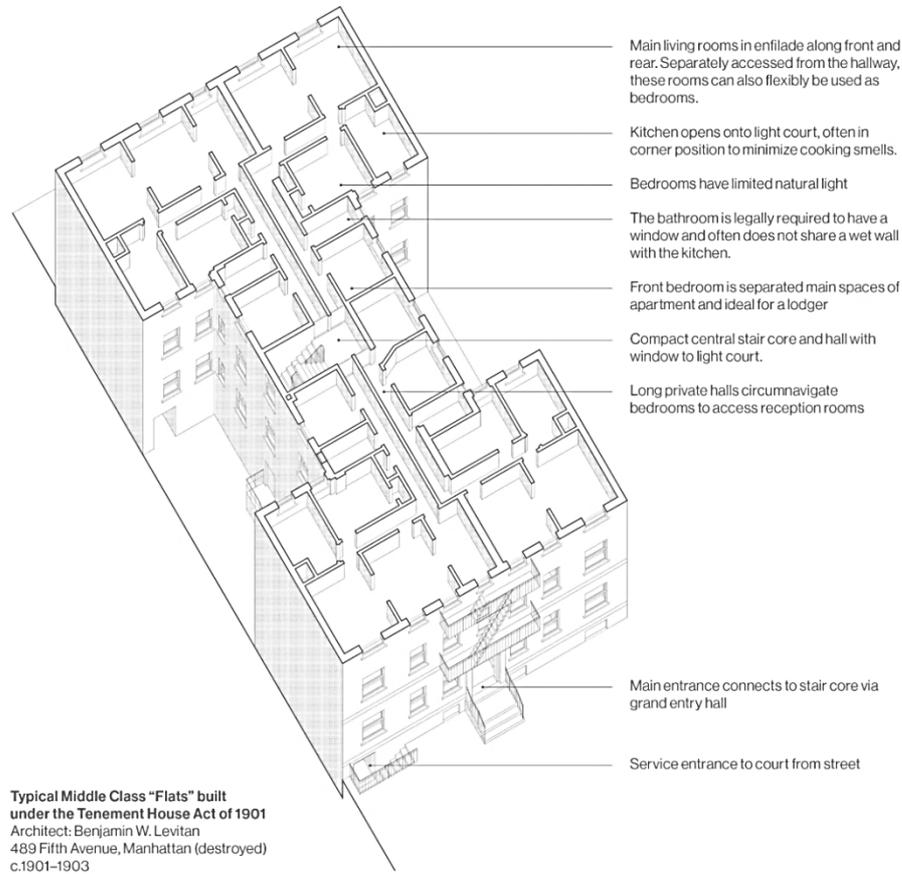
Model of Tenement House under the Tenement House Act of 1901 (URL-7)
